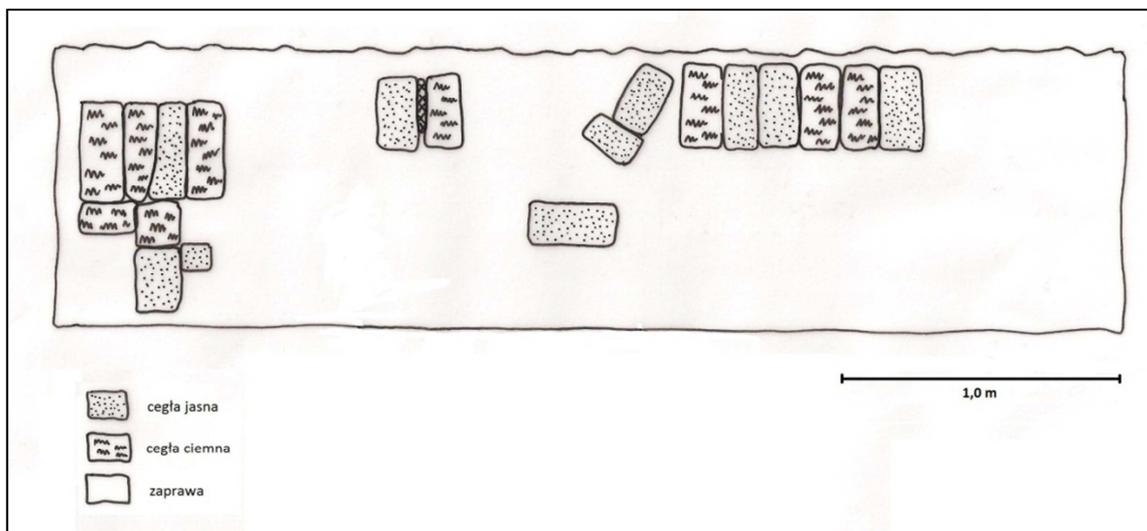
A draft of bricks' arrangement (plan) from the first fragment of a wall. (Cegła jasna- light brick, cegła ciemna – dark brick, zaprawa- daub)
